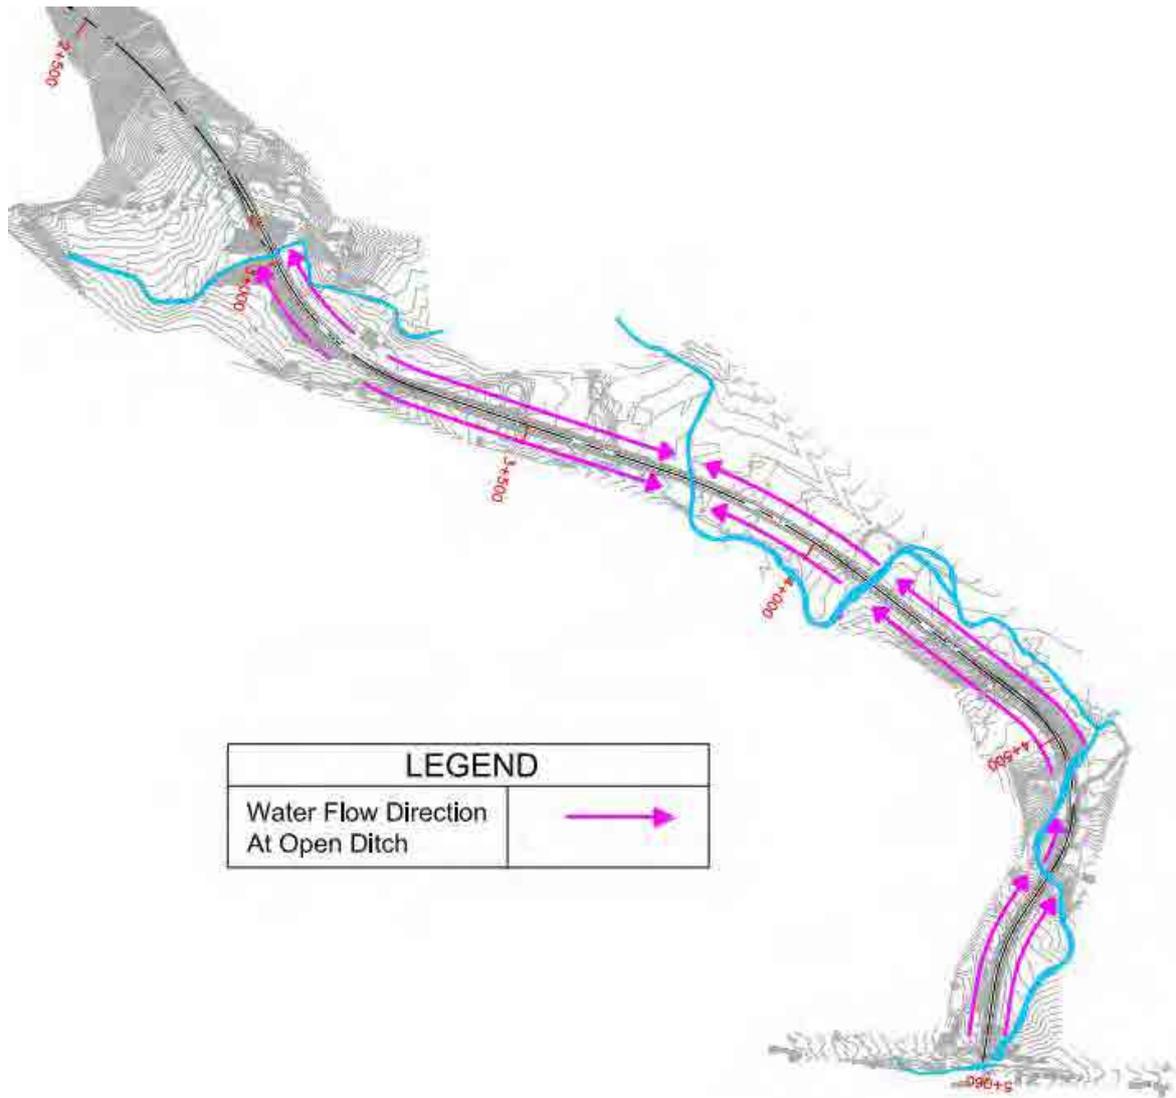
DRAINAGE DESIGN CONCEPT AT APPROACH ROAD SECTION
